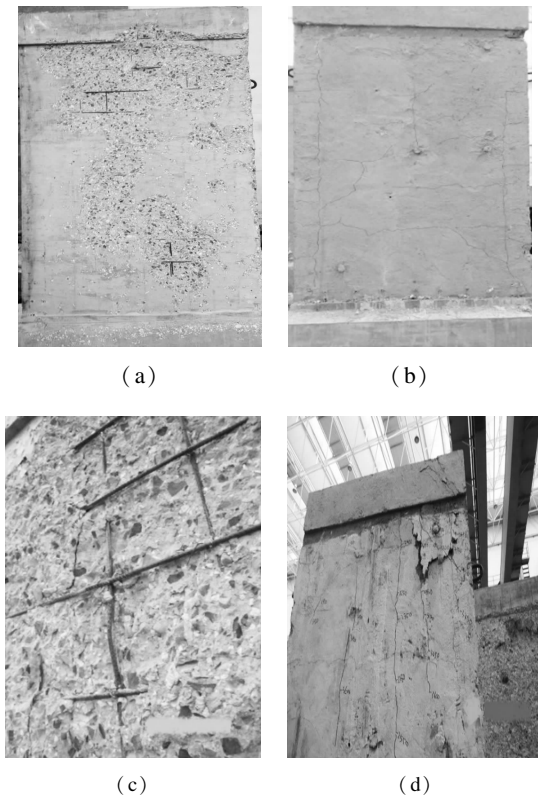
The characteristics of specimen DW4. (a) Exposed side post-fire; (b) Unexposed side post-fire; (c) Concrete cover spalling and reinforcement buckling after loading; (d) Crack patterns and concrete crushed on the unexposed side after loading
